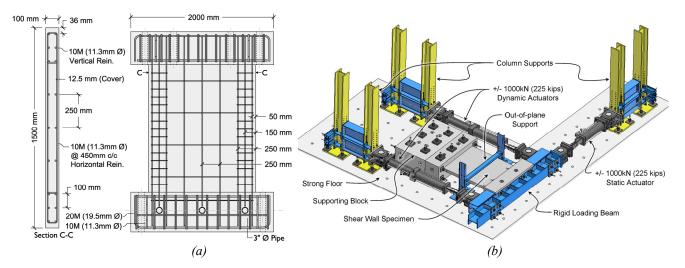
(a) Geometry and steel reinforcement details for the scaled shear wall test specimen. (b) Experimental test setup
